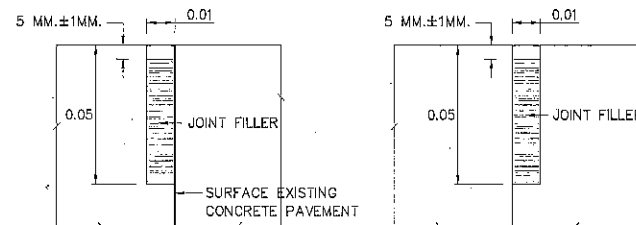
DETAIL OF JOINT BETWEEN NEW AND EXISTING CONCRETE PAVEMENT
